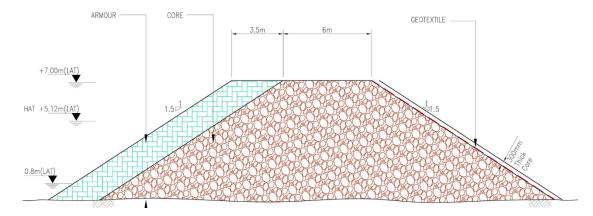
Western Basin Expansion typical section of peripheral bund wall – armour, core and geotextile (bund wall type B1)
